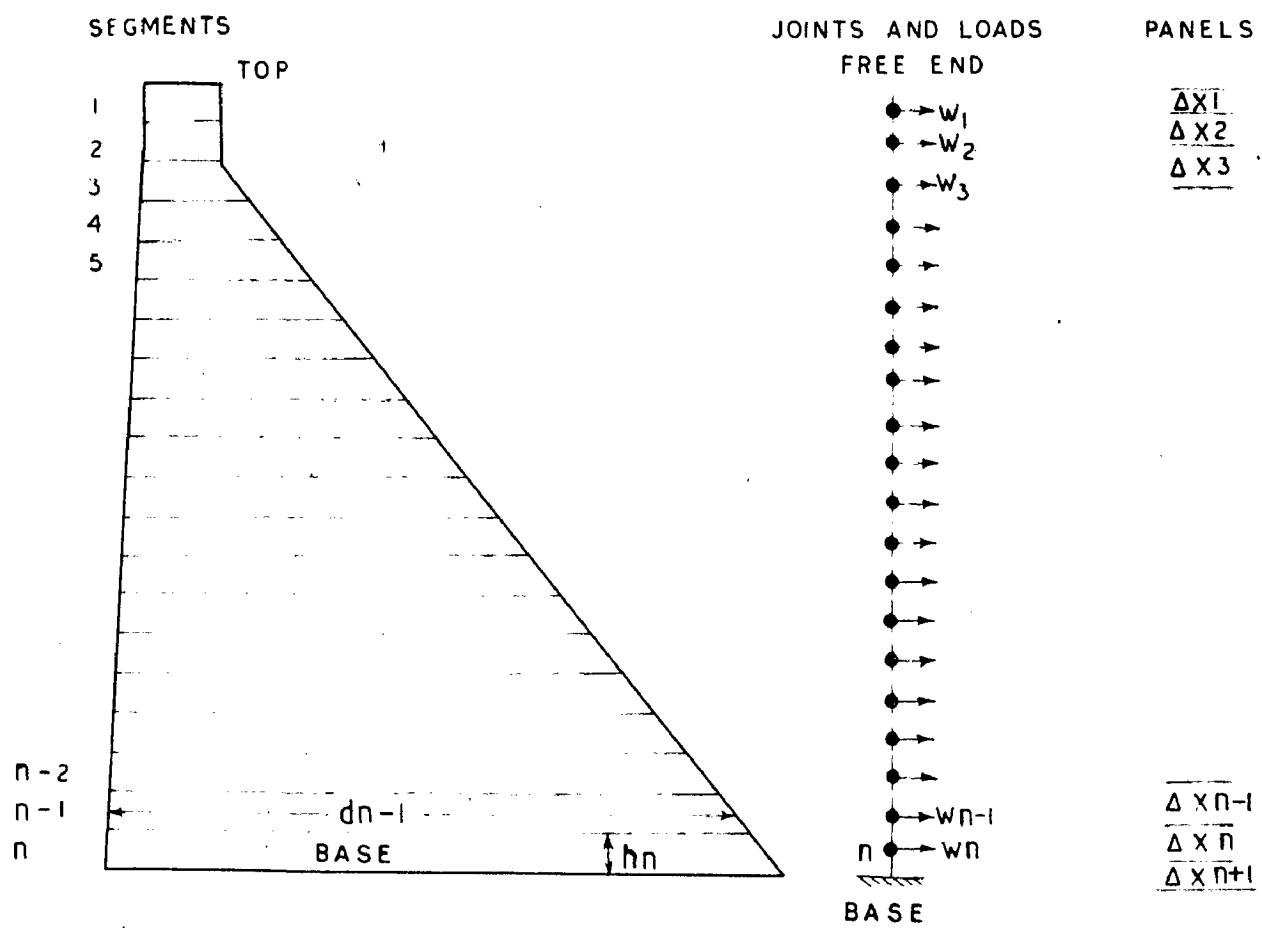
DAM SECTION AND DISCRETE SYSTEM
